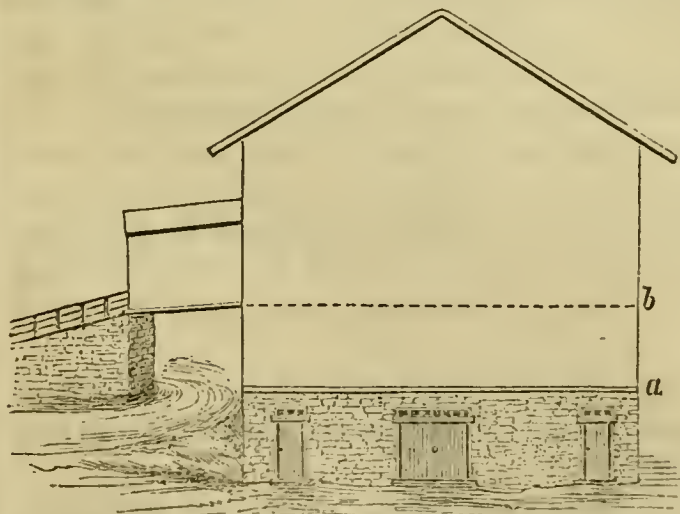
END VIEW OF LARGE THREE-STORY BARN.
